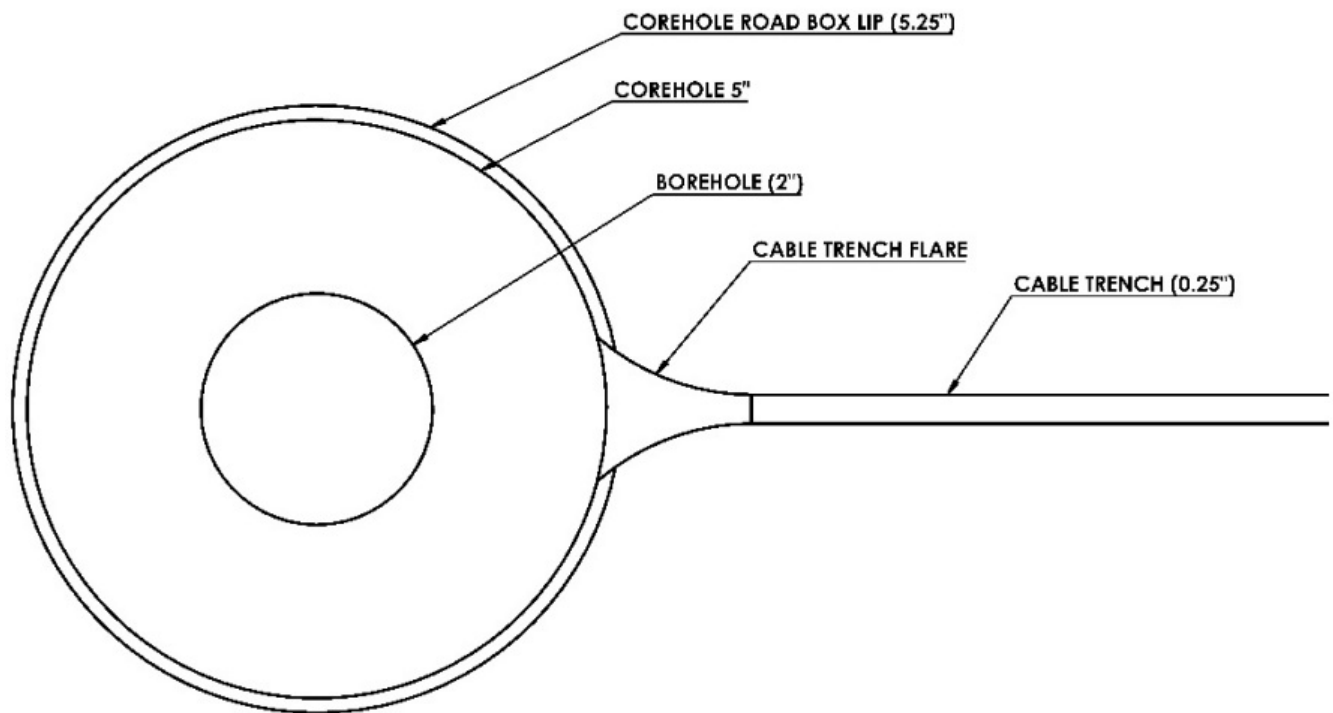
Flared slit trench meeting corehole, plan view (depiction)
